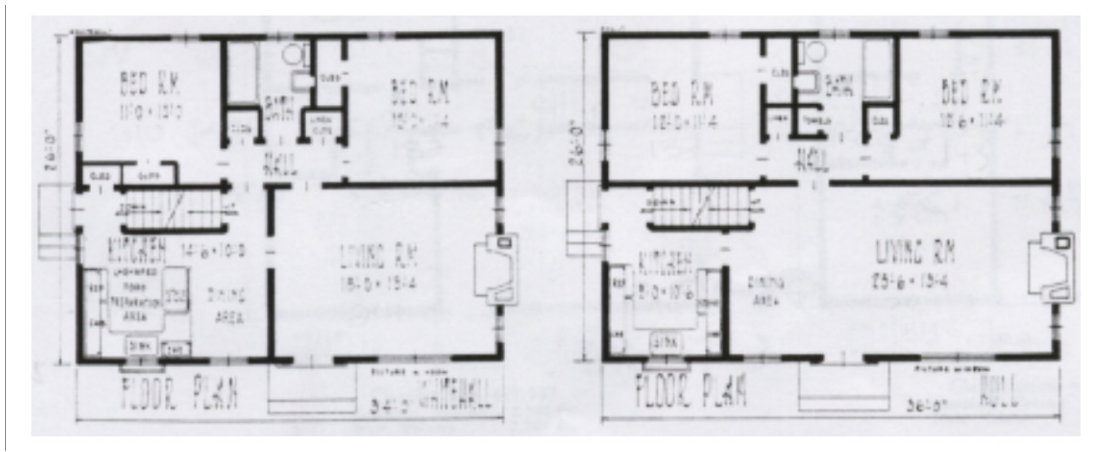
Exhibit F: Home Plan Book Company. "Book of New Homes: Designs and Floor Plans for 43 Practical Homes". St. Paul: Home Plan Book Co., 1954 (
